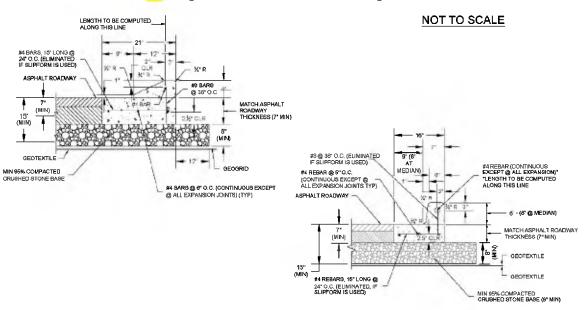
Requirements for Curbs on Asphalt Concrete Streets.
